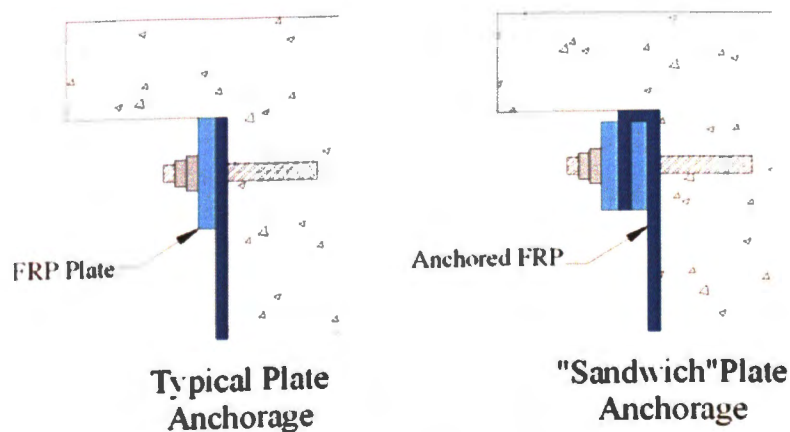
Plated Anchorage Details in Ortega (2009)
